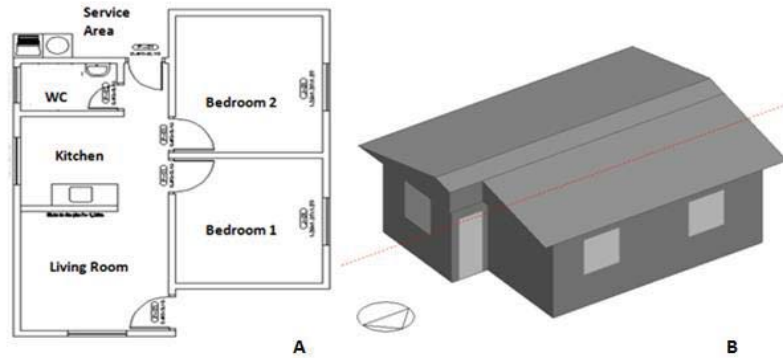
(A) Plant design and (B) DesignBuilder model of the case study. Source: Authors, 2016
